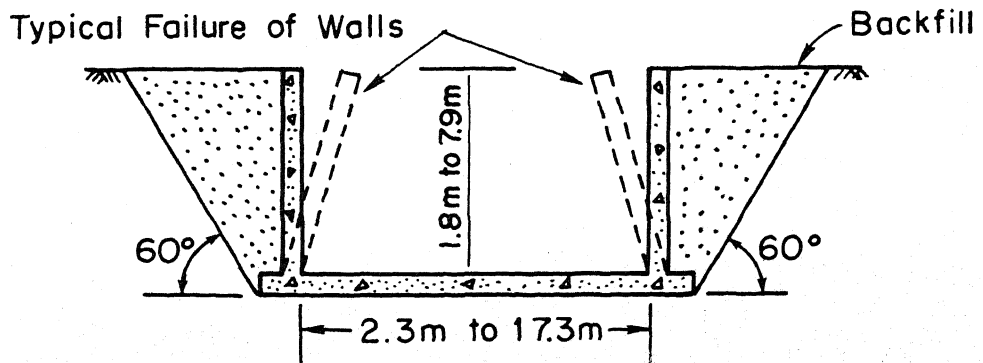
SECTION THROUGH OPEN CHANNEL/FLOODWAY AND TYPICAL MODE OF FAILURE DUE TO EARTHQUAKE SHAKING.
